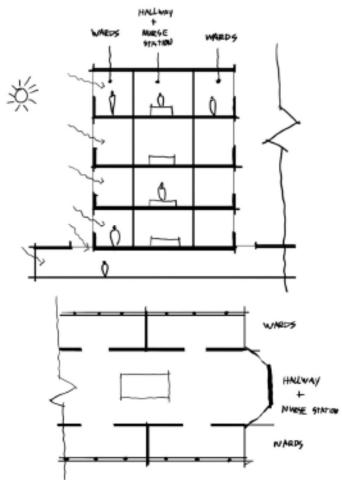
Pretoria West Hospital conceptual section and plan (author)
